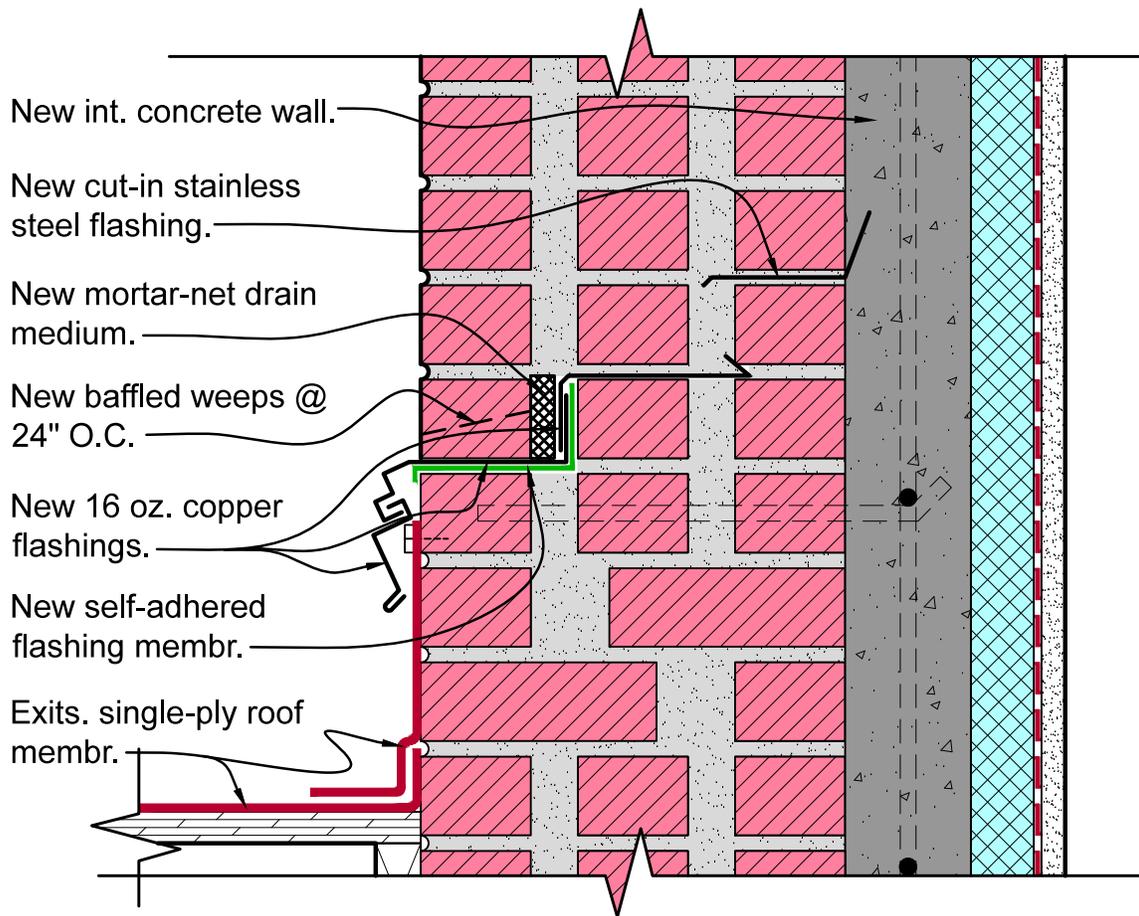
(2): Through-Wall Flashings Above Low Roofs
